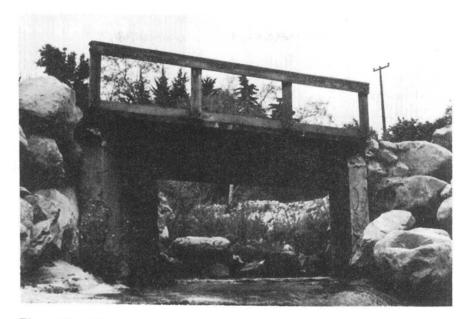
Torito Road bridge over East Branch Toro Canyon Creek (looking upstream at river mile 0.16).
